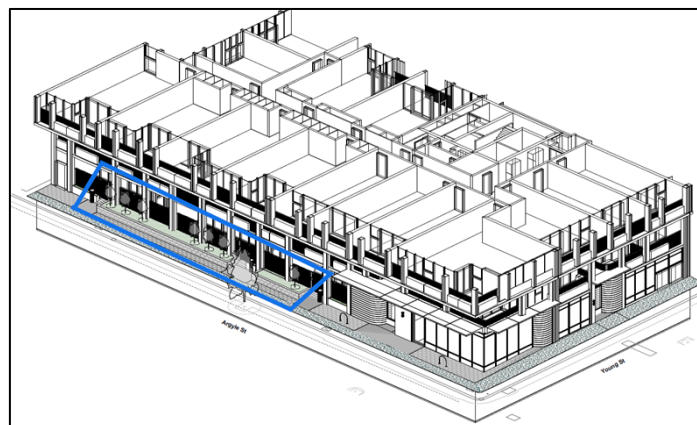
Landscape Plan dated 25.12.2025 showing raised planters within the widened Argyle Street footpath outlined in blue (Source: FK Architects, dated 10.03.2026)
